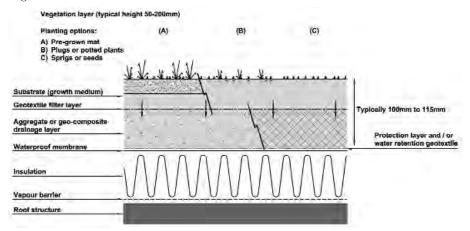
Example details of a green roof (adapted from Tarr, 2002)
